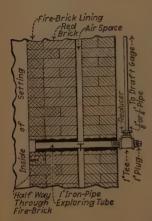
Draft-pressuregage exploring tube installed in setting.
